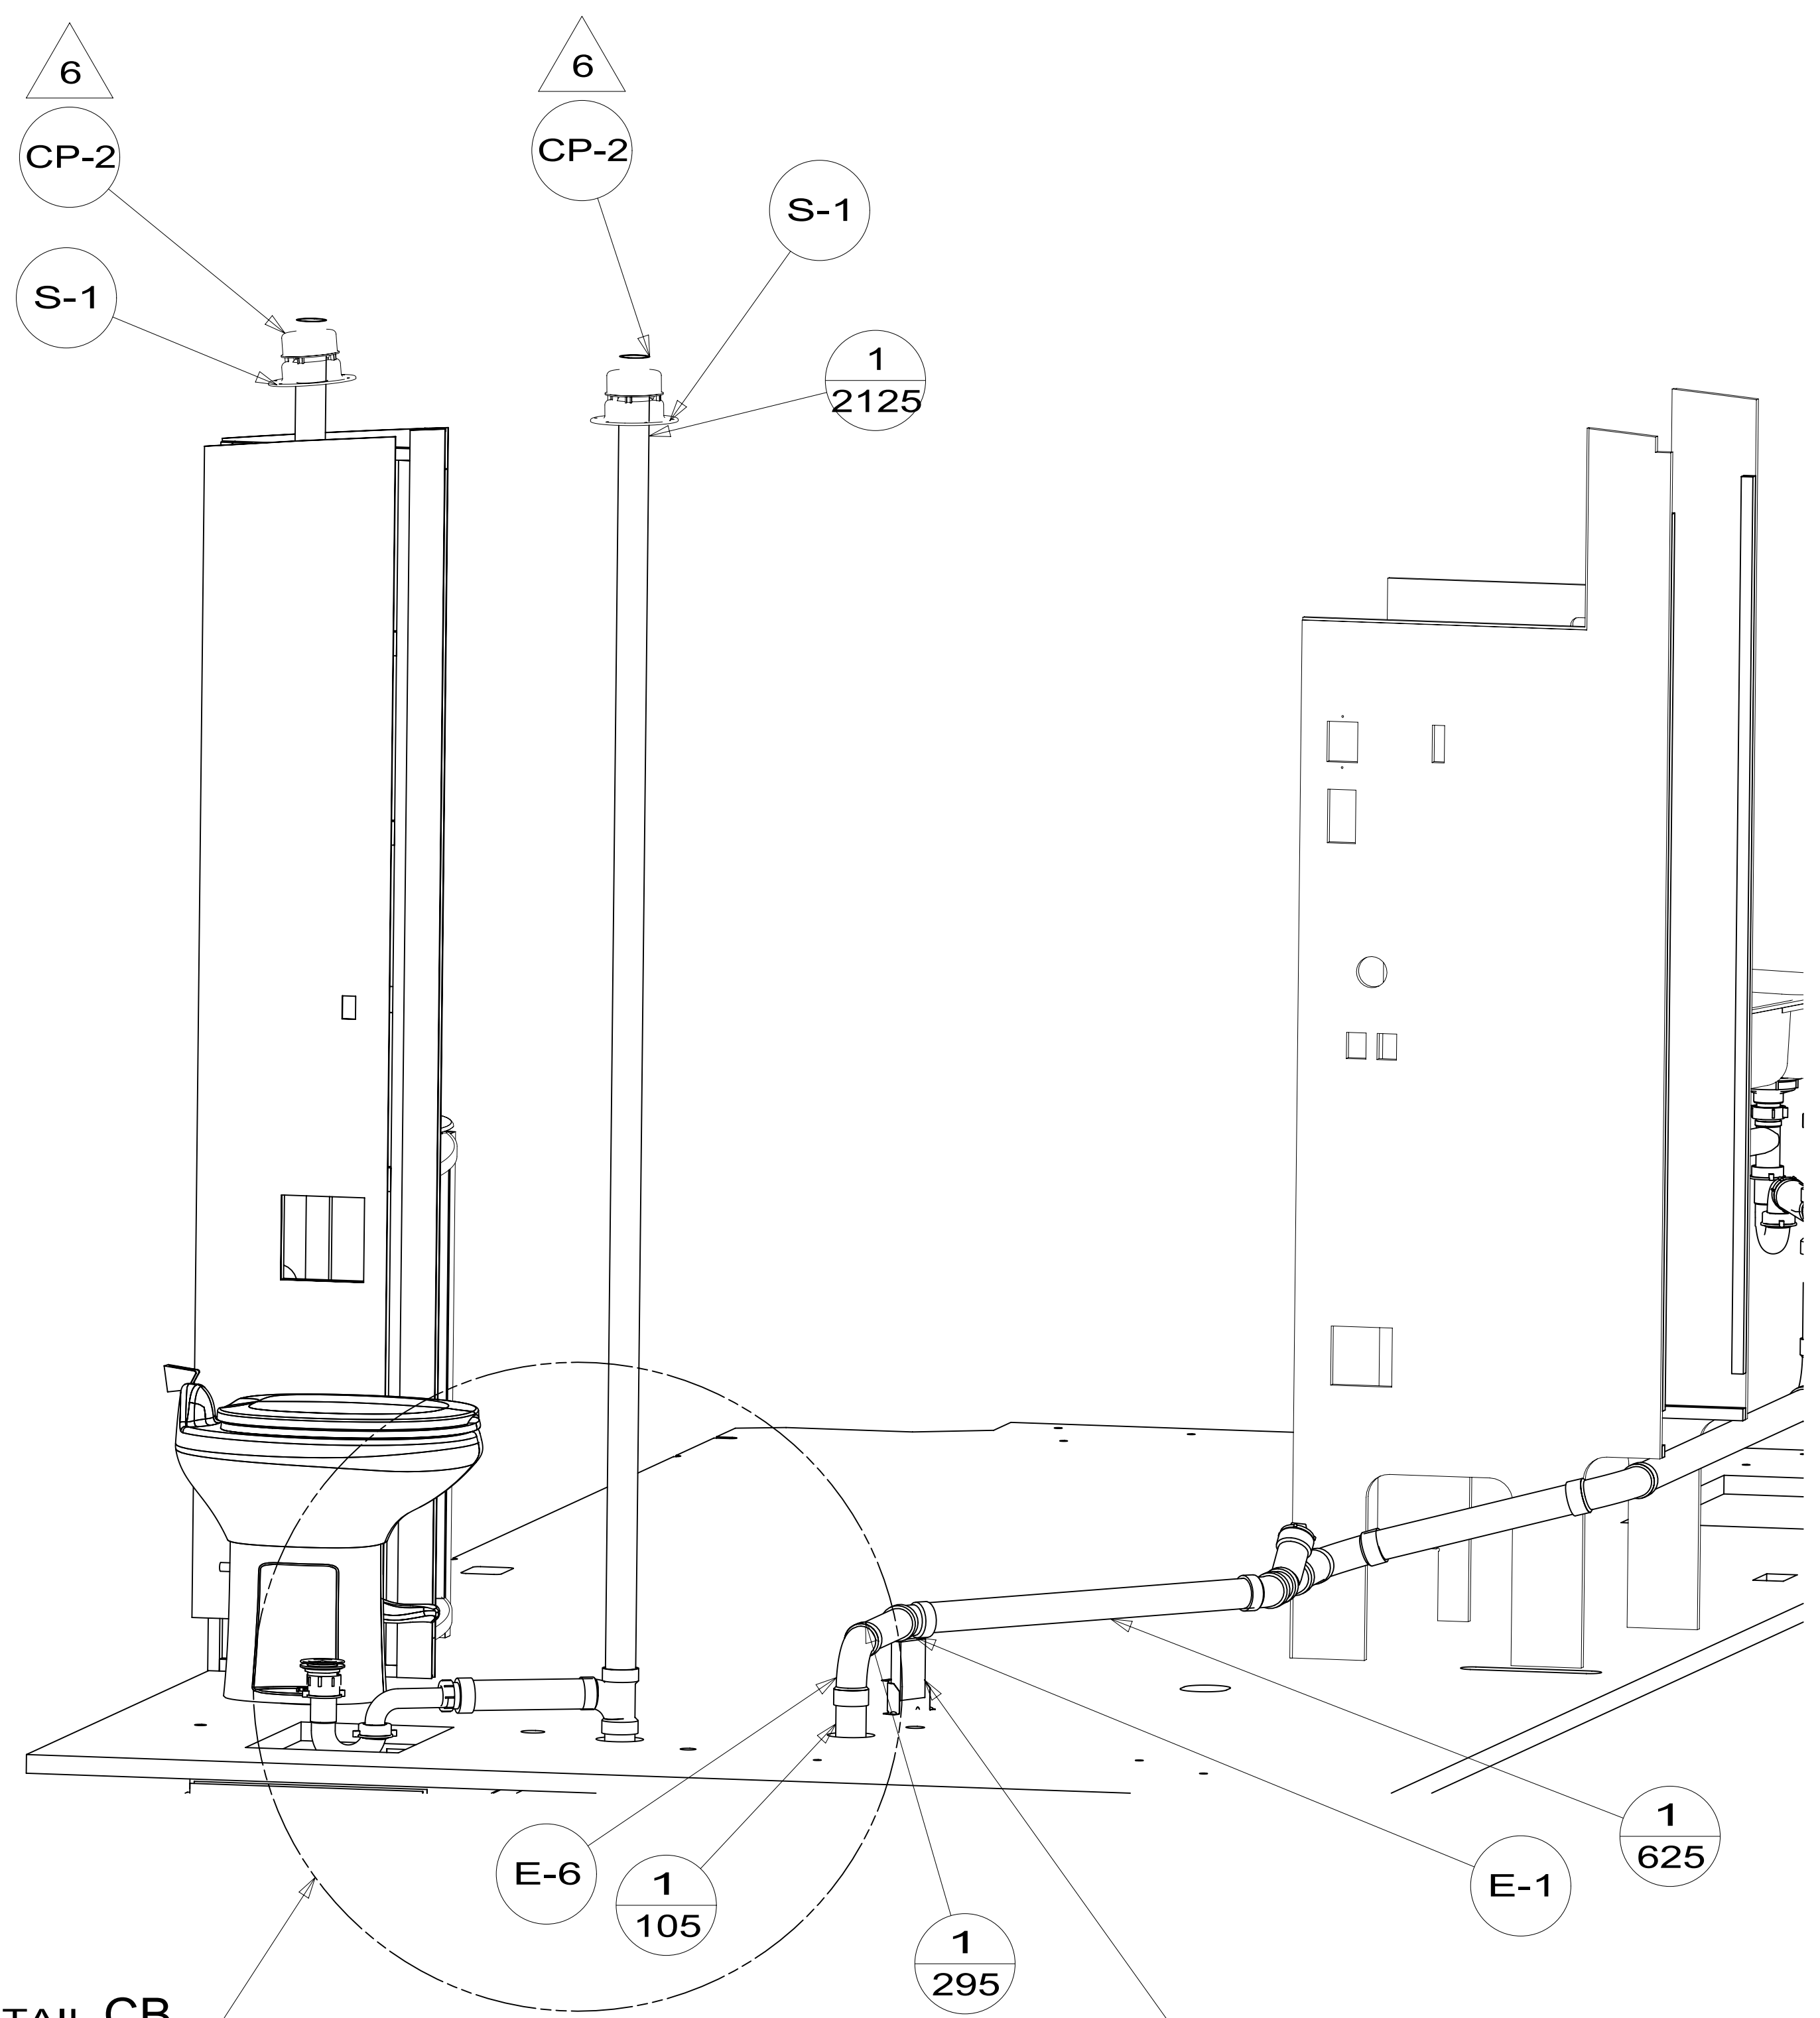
DETAIL BC (SHOWN W/OUT CABINETS AND FLOOR)
